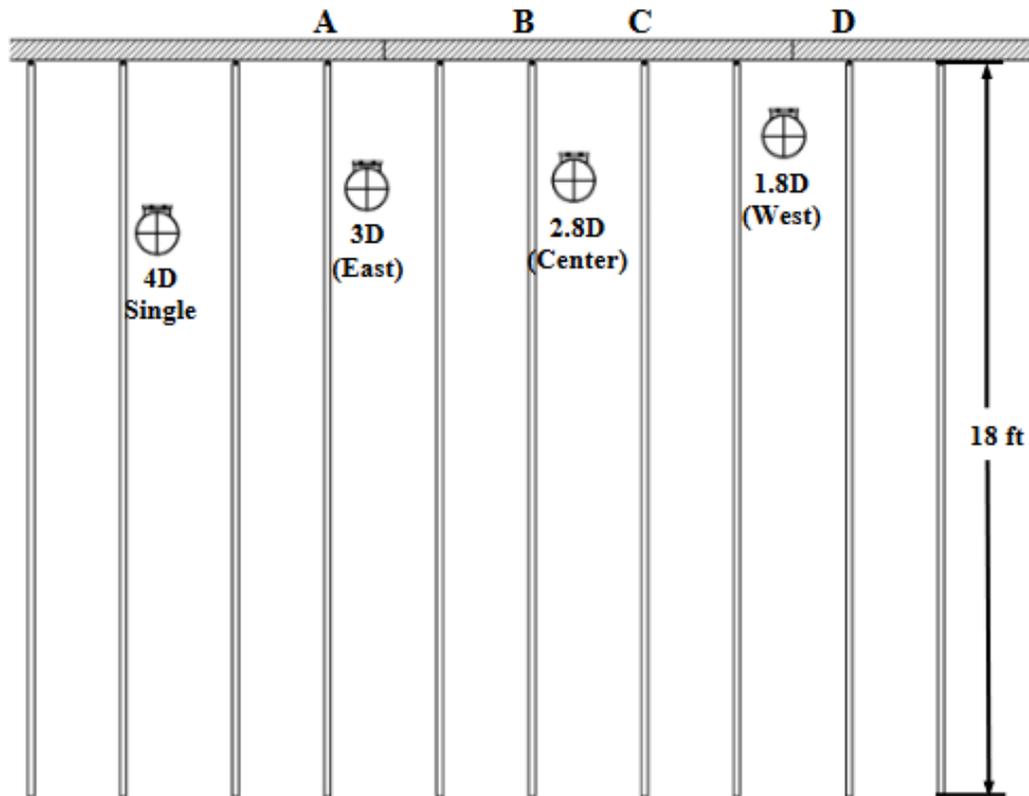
Location of ribbed strip reinforcements and the piles that were tested as a group (Farnsworth, 2020).
